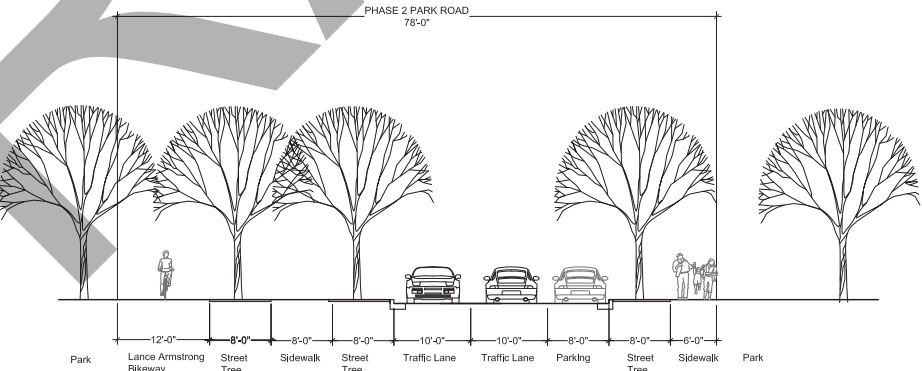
South Park Road / Cesar Chavez Street Road Diet Section
